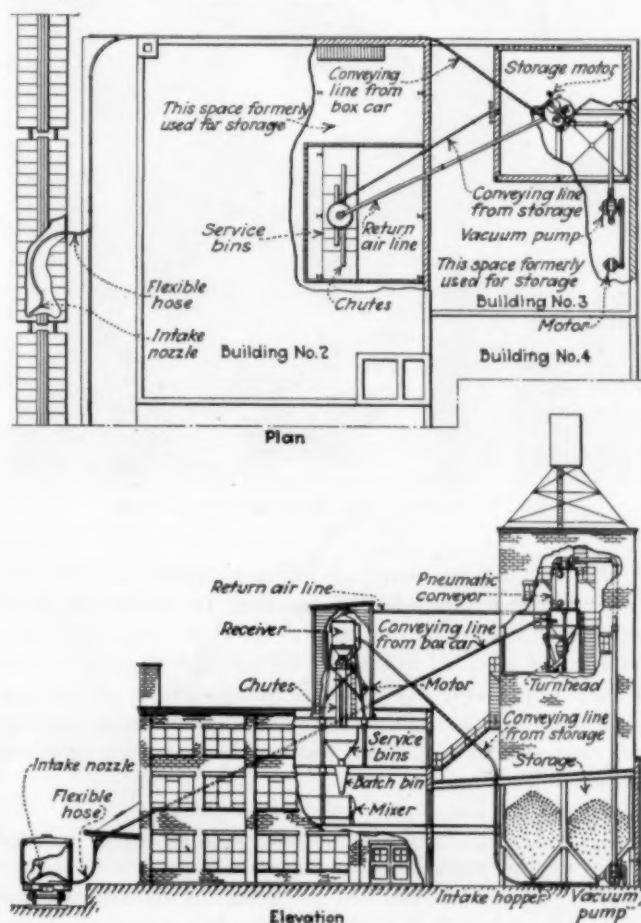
Plan and Elevation of Plant Showing Layout of the Conveying Equipment
